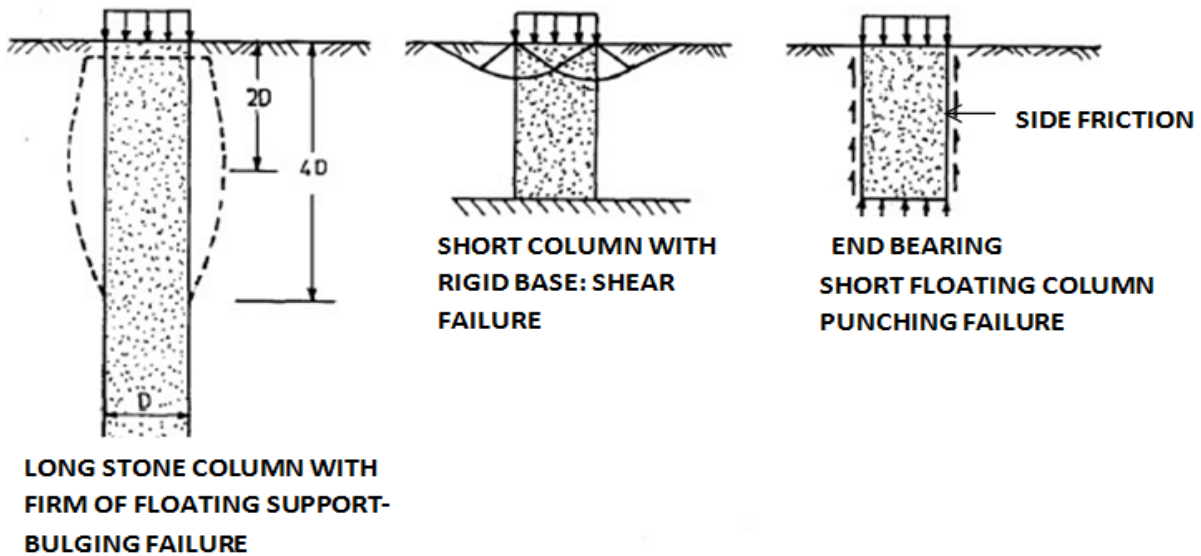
Failure mechanism of single stone column in a non-homogenous soft layer
